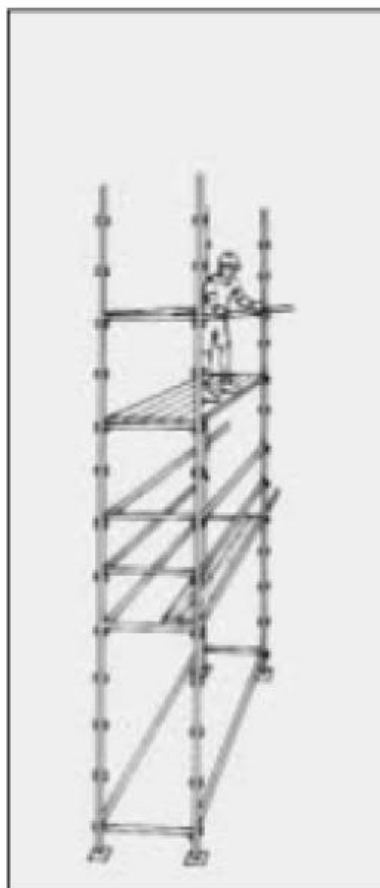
Immediately install edge protection after enough components of the scaffolding have been erected. A section of the platform may be left open to allow scaffolding components to be passed between lifts.
